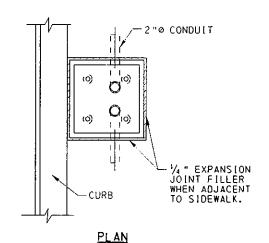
DETAIL FOR TYPE A POLE BASE FOR CUT OR LEVEL SECTION
